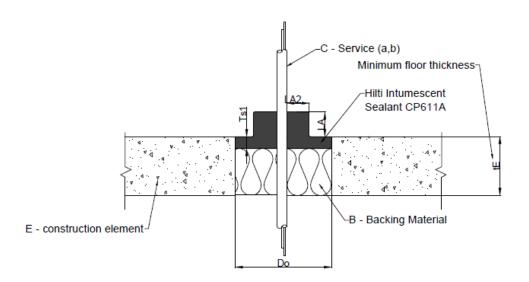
Side View, seal type 19, Steel & uPVC Conduits or tubes ≤ 16mm OD in concrete floor, CP611a + additional protection
